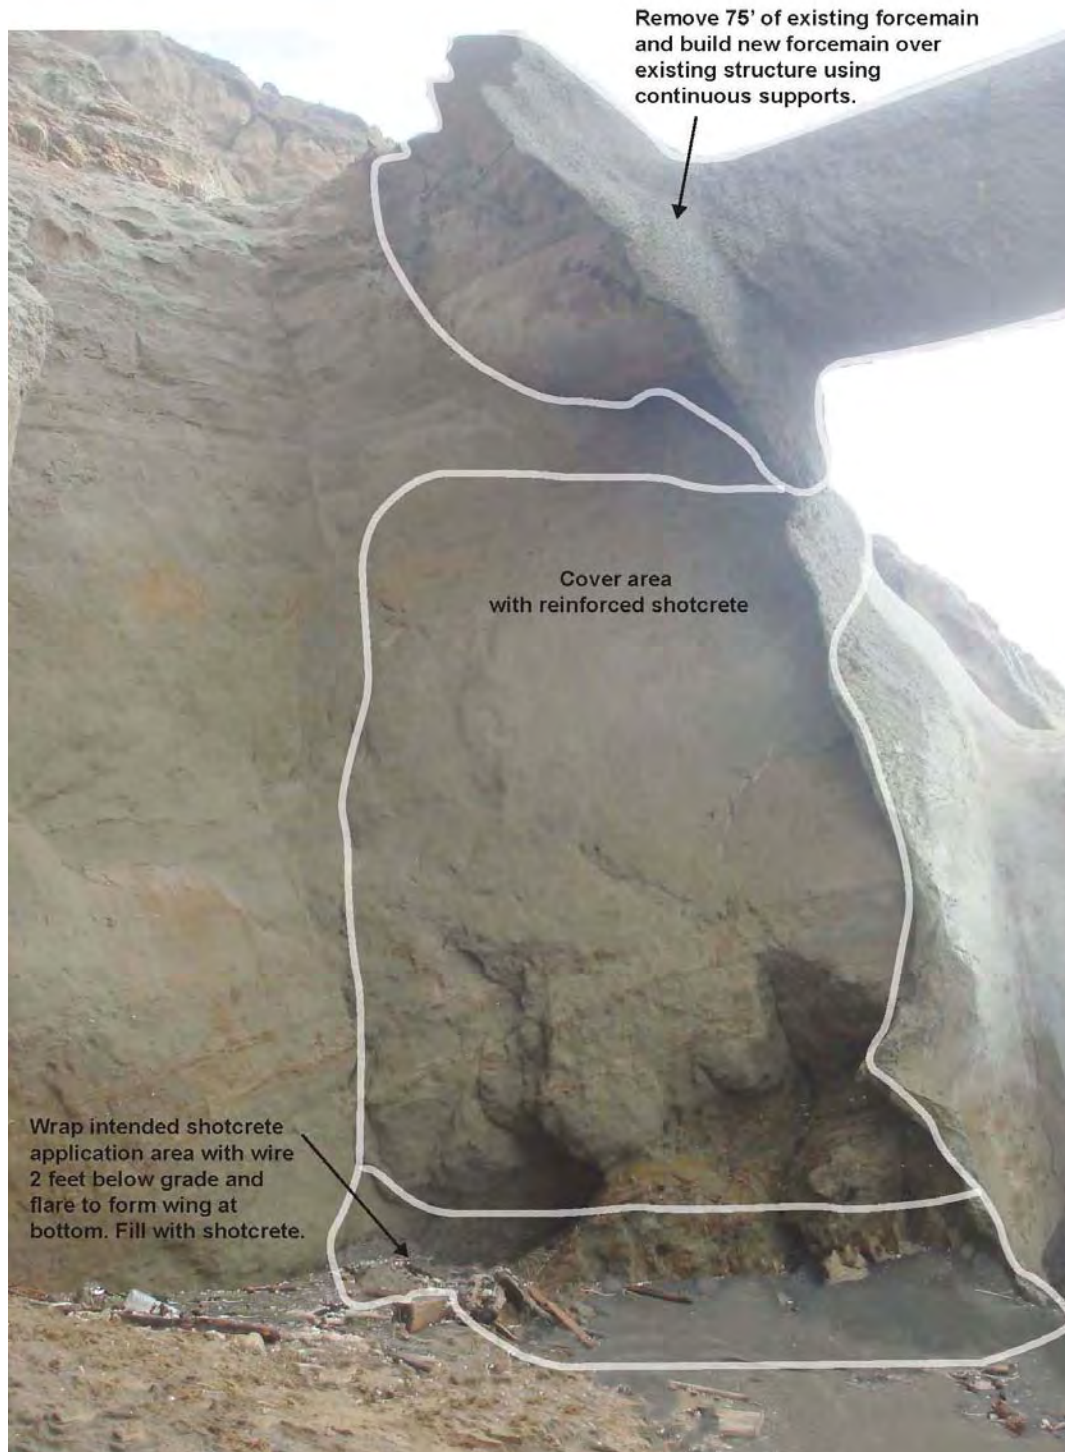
View from the North of Proposed 2010 Maintenance to Vista Grande Outfall Structure
